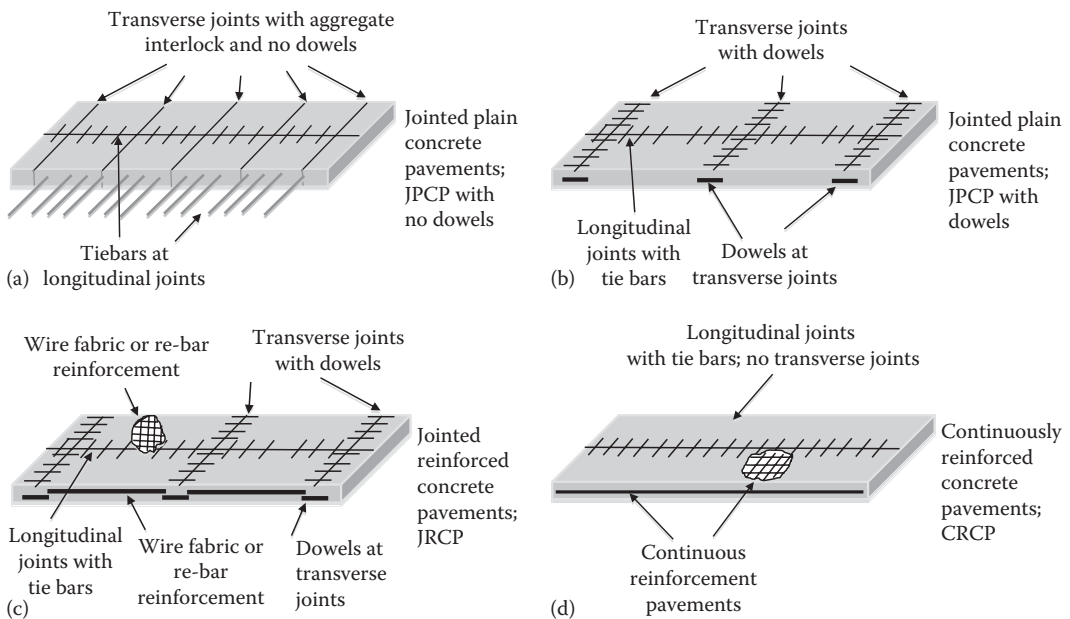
Jointed plain concrete pavement (JPCP) with tiebars and (a) no dowels, (b) with dowels, (c) jointed reinforced concrete pavements with tiebars and dowels, and (d) continuously reinforced concrete pavements (CRCP). The slab has continuous reinforcement.
